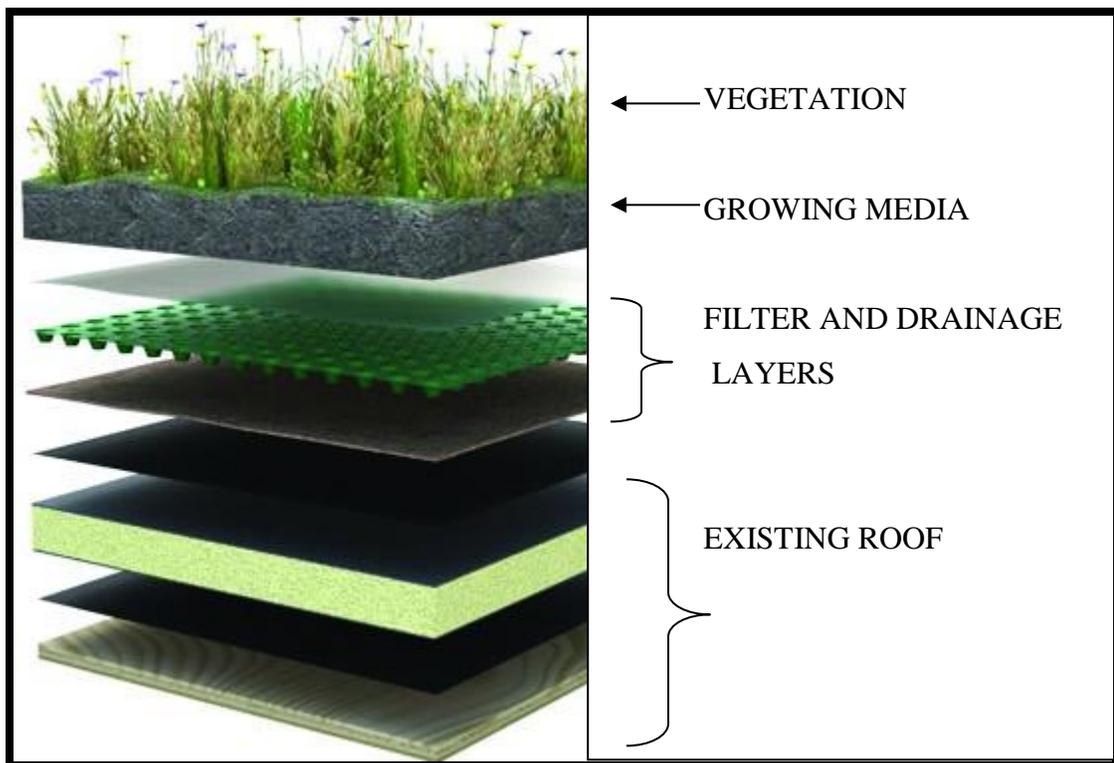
Layers of a green roof (Adapted from dgreenworks.org)
